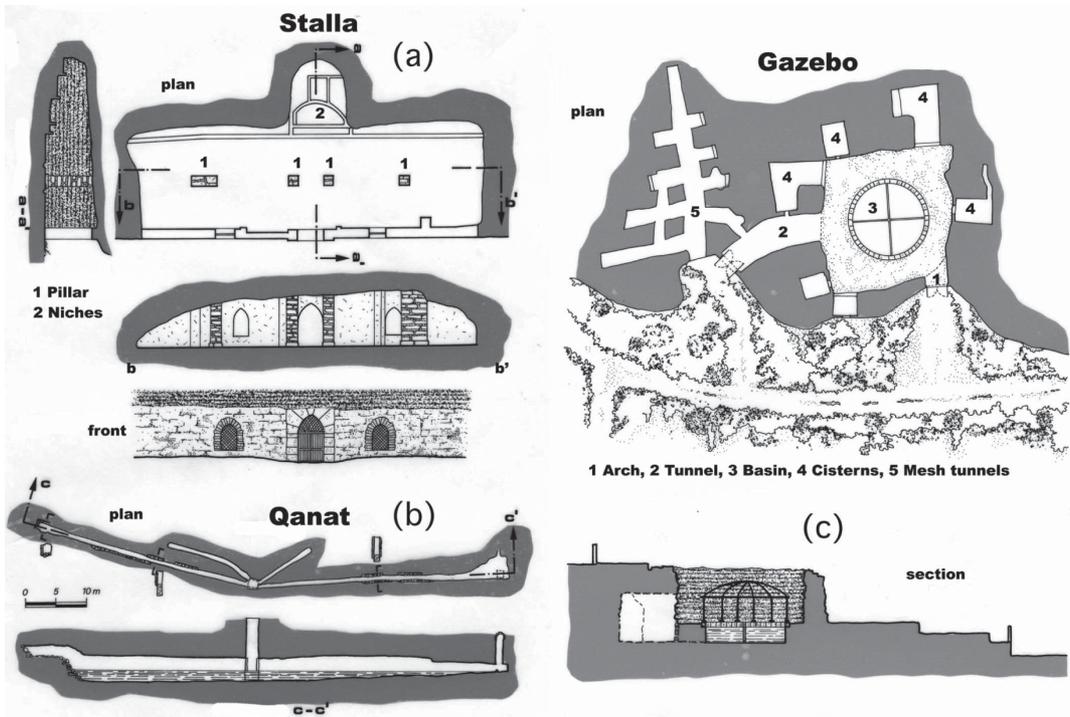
Plans and sections of the main Hypogea a) Stalla; b) Qanat; c) Gazebo and “mesh” tunnels.
